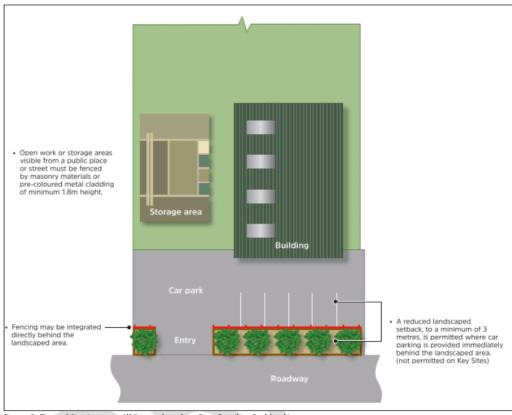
Typical Site Layout - All Sites other than Ring Road or Goddard Lane
